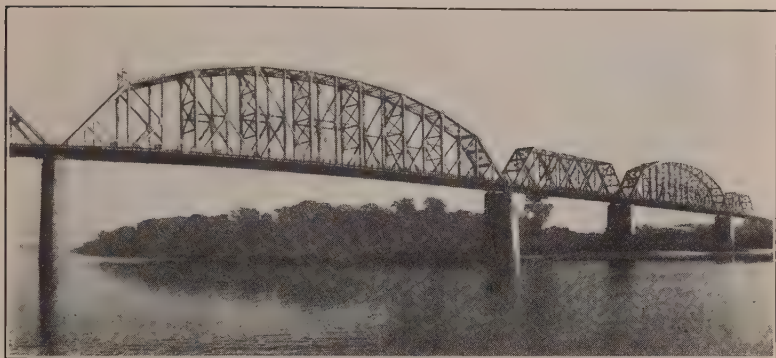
Ft. Span Pin-Connected Trusses. Typical of 1915 Construction.
